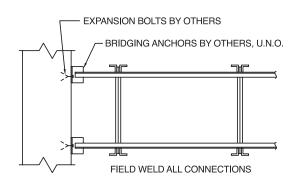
HORIZONTAL BRIDGING ANCHORAGE
